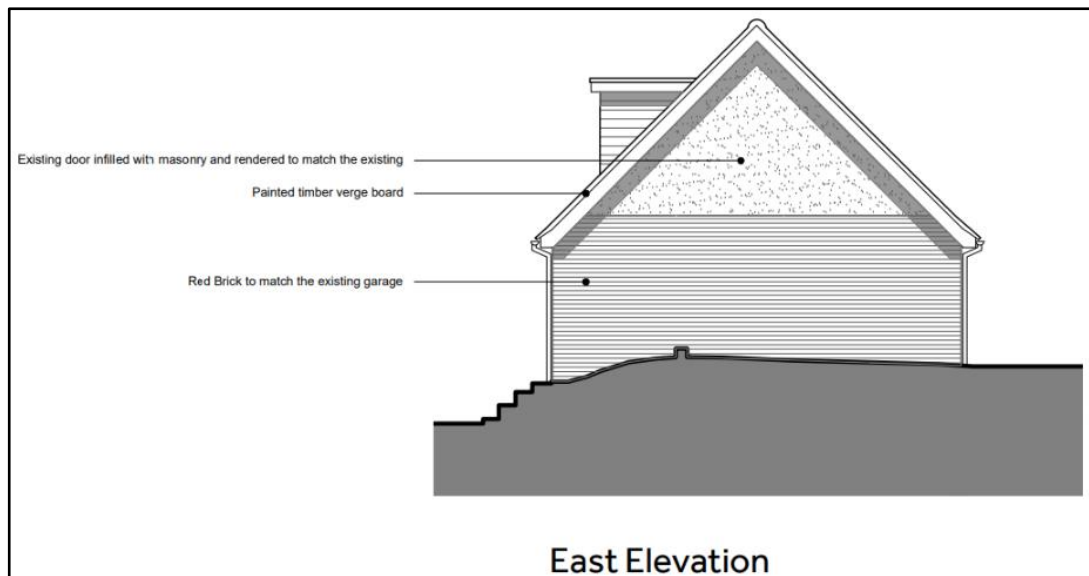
PROPOSED EAST ELEVATION OF GARAGE (CLAGUE ARCHITECTS)
